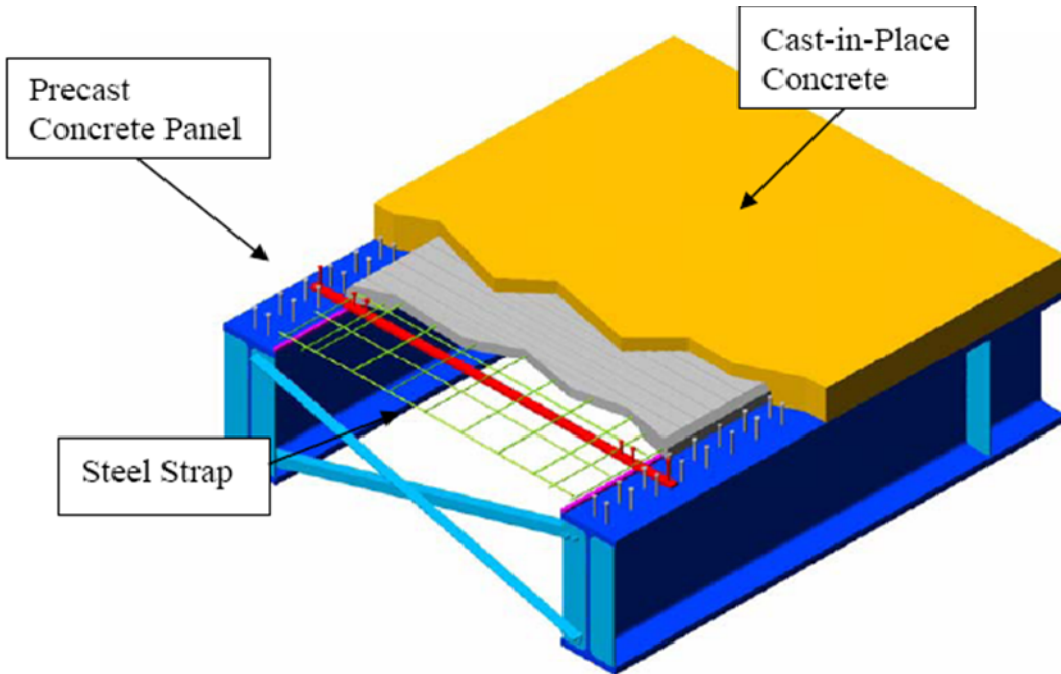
Bridge Deck Showing the Precast Panels and Completed Deck Concrete in the Steel Free Deck System (Bowen 2006)
